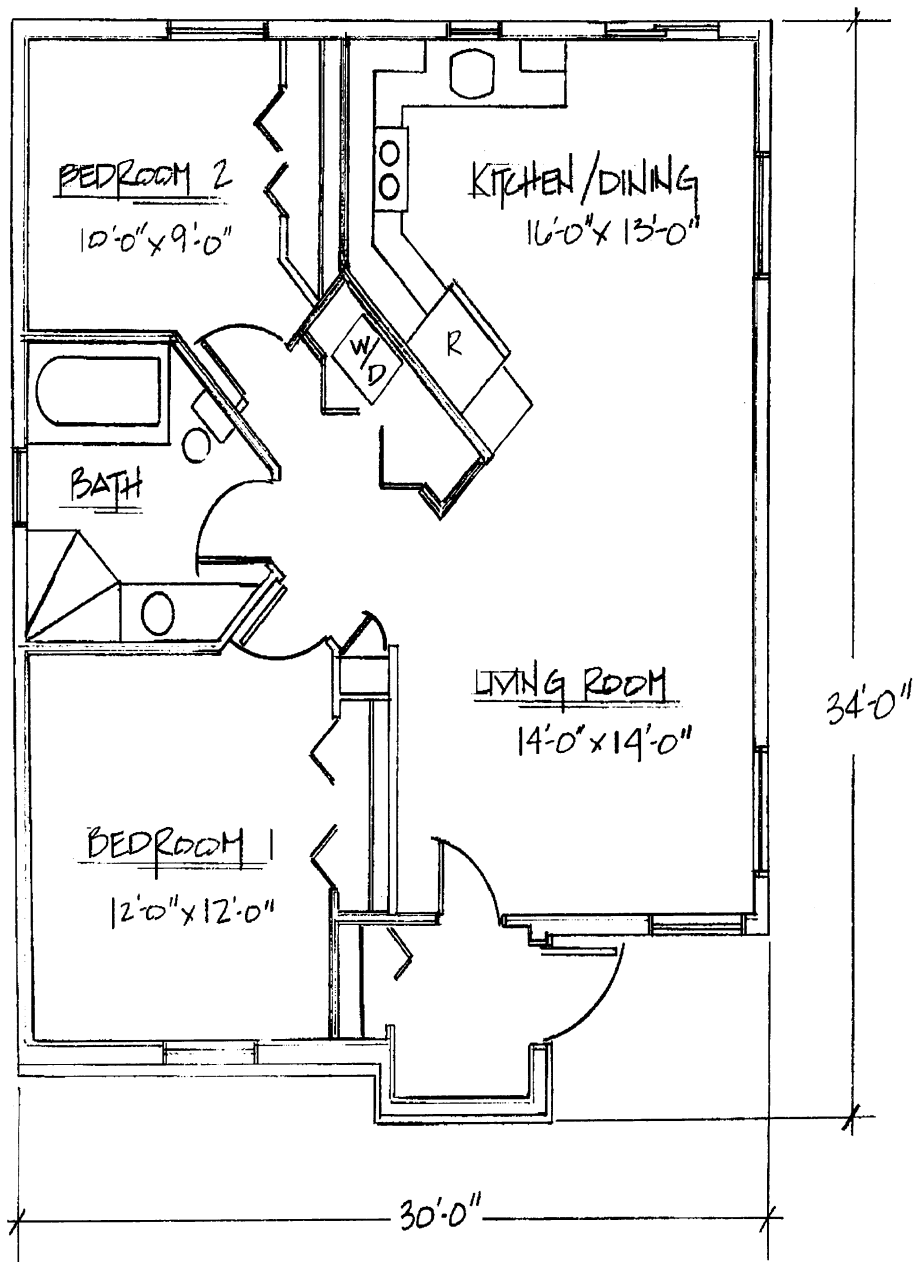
Newly Constructed, Fully Accessible Floor Plan
